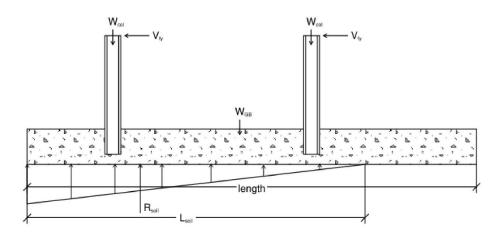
Cantilever column pair with grade beam and soil pressure distribution.
